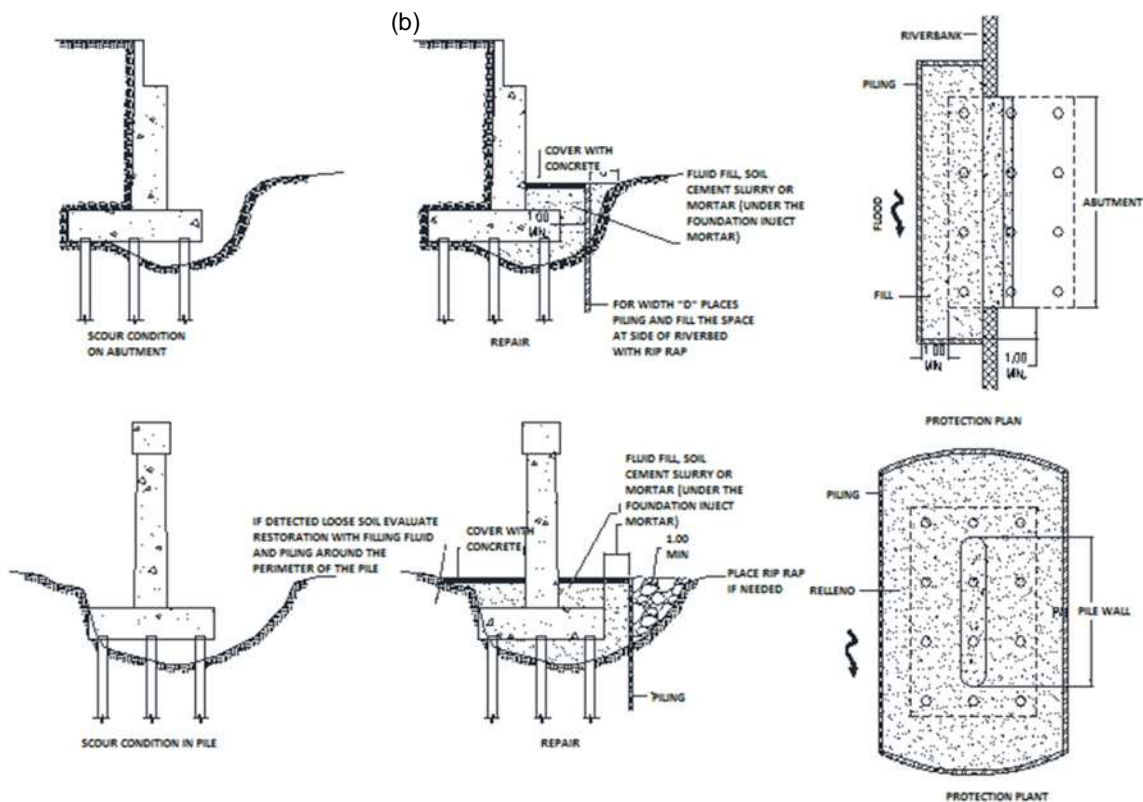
Repair proposal in piers and abutments of foundation with piles. (SPOP, 2014)
